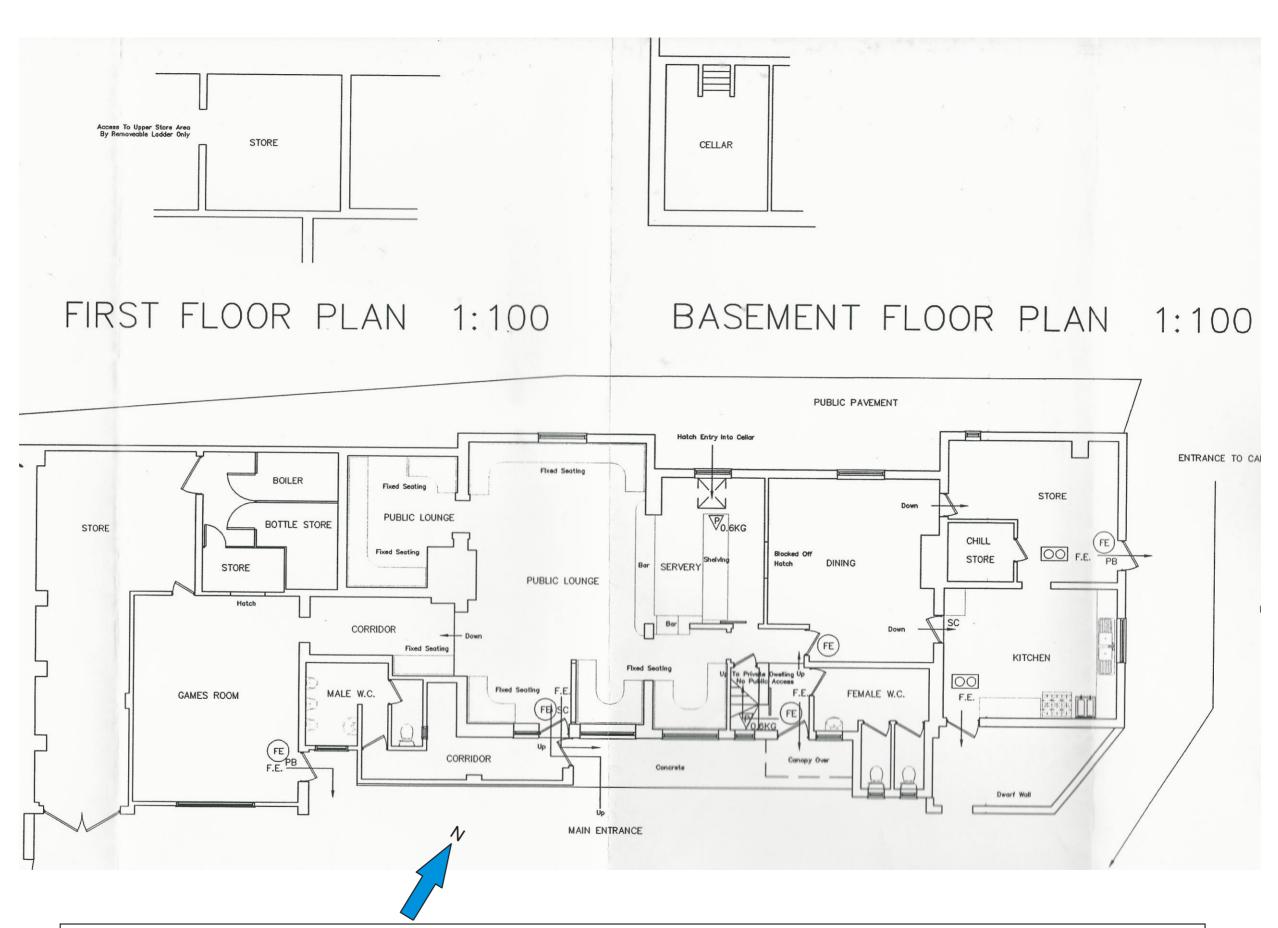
Plan showing the existing basement, ground floor and first floor layouts of the Duke of York public house at scales of 1:100, (extracts from Architects plans)
